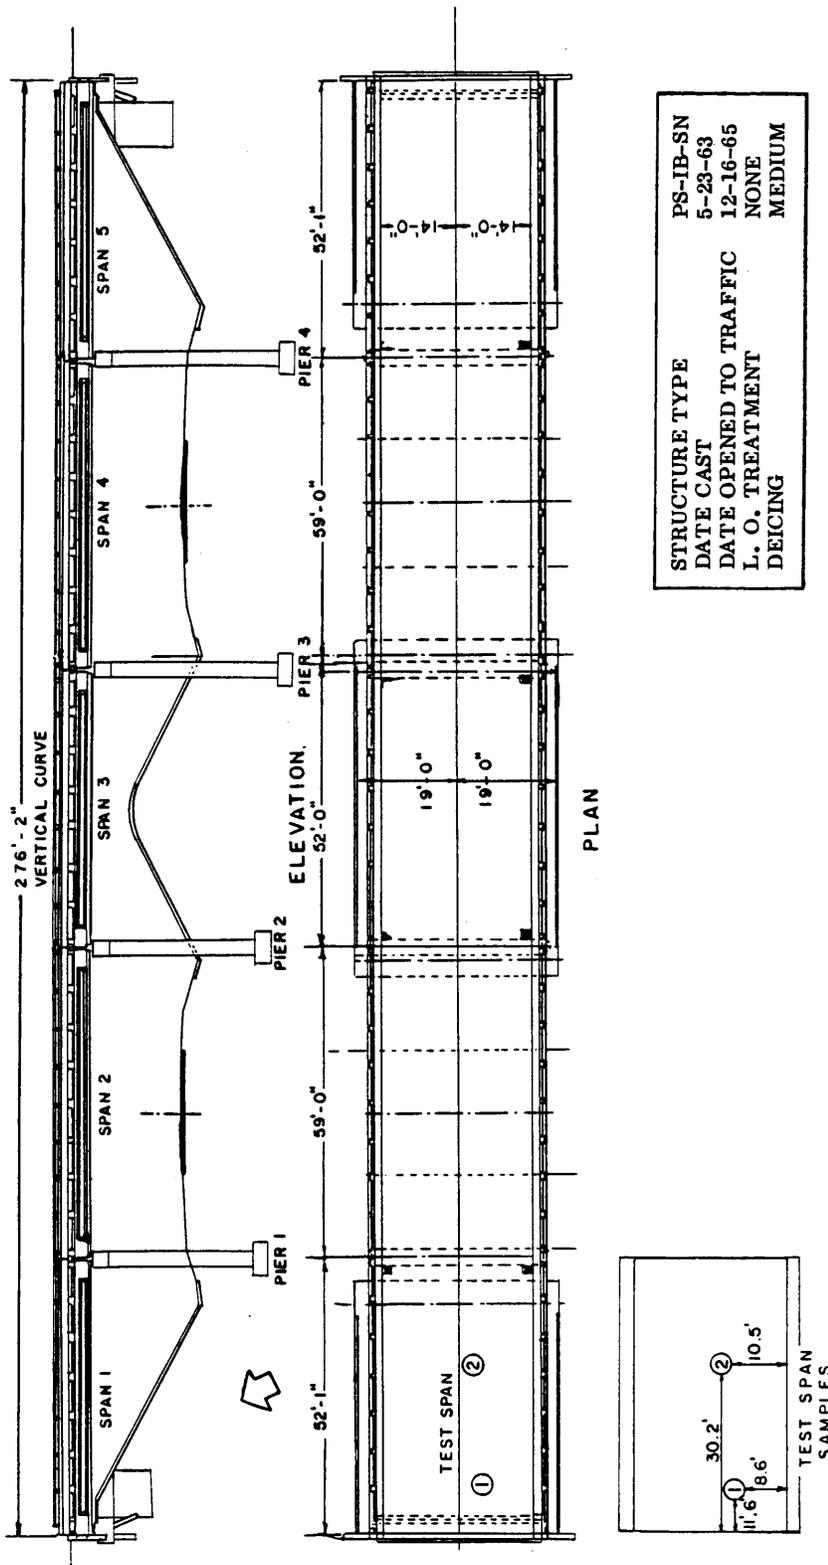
Plan for bridge #3; also shown are the locations of test samples.
